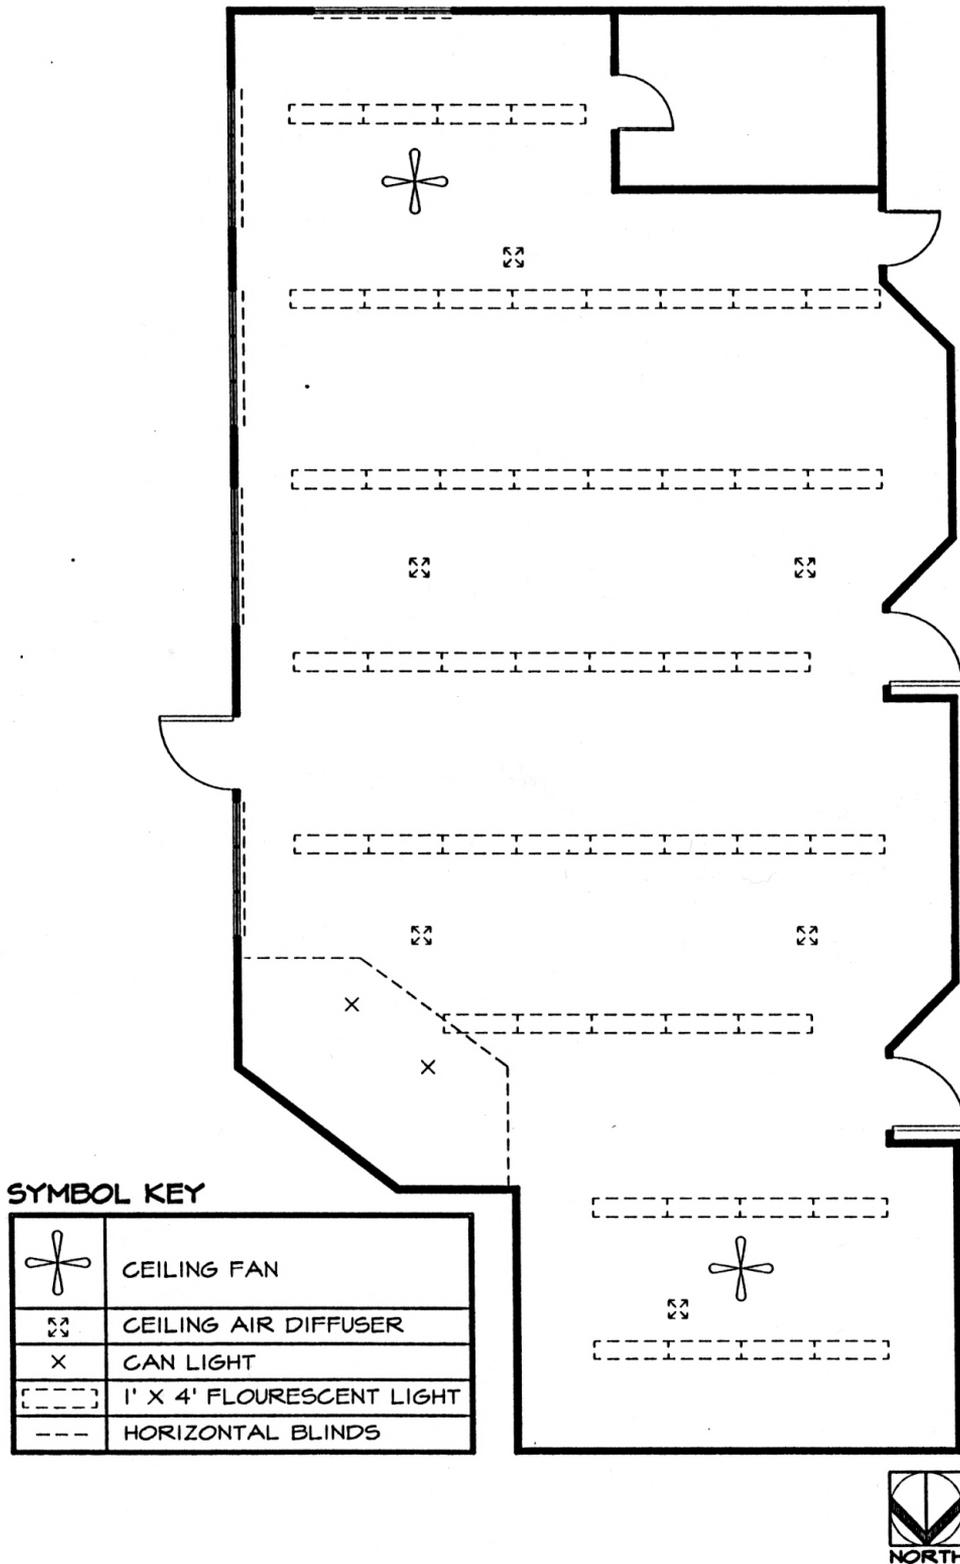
Plan of Skilled Care Dining - Site 1.
